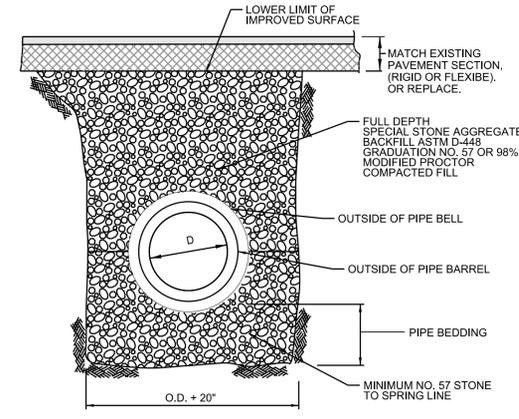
DETAIL - DRAINAGE SUMP EXCAVATION
